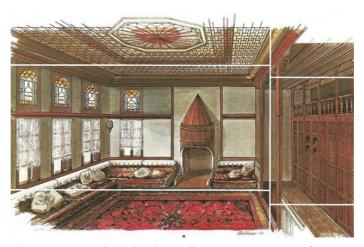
Turkish House, Basic Principles for Arrangement of Room Vertically and Ceiling Cover
